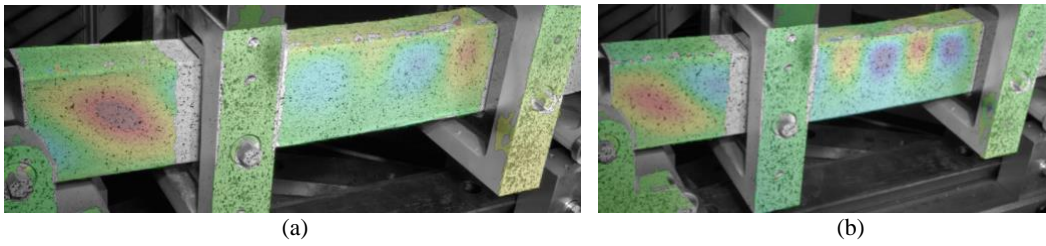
Buckling mode of tested specimens for beam with layer arrangement N3(30) and two different cross-sections: LC0 (a), LC10 (b).
